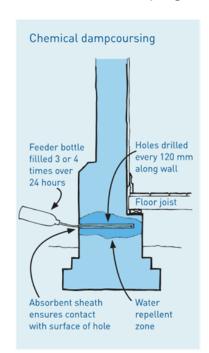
Chemical dampcoursing. Cross-section through a solid wall showing the gravity-fed system. Note that the new water-repellent zone should be installed below all floor timbers.
